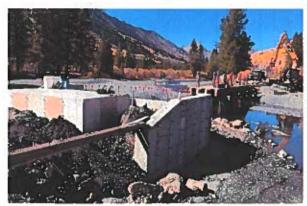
Concrete anchor block, abutment and wingwall at southern (downstream) bridge end.
